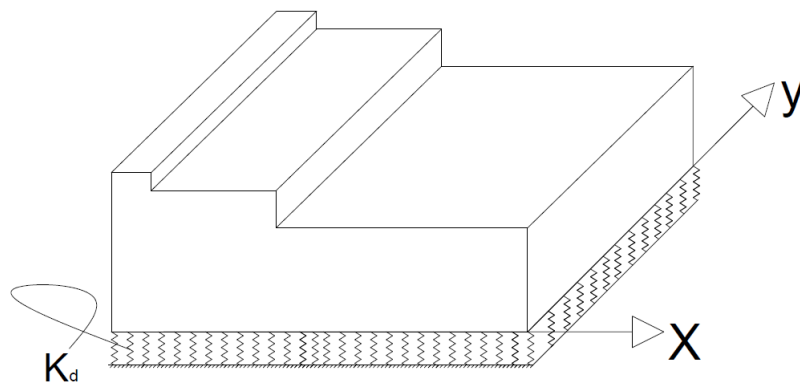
MONOLITHIC STRUCTURE ON ELASTIC FOUNDATION
